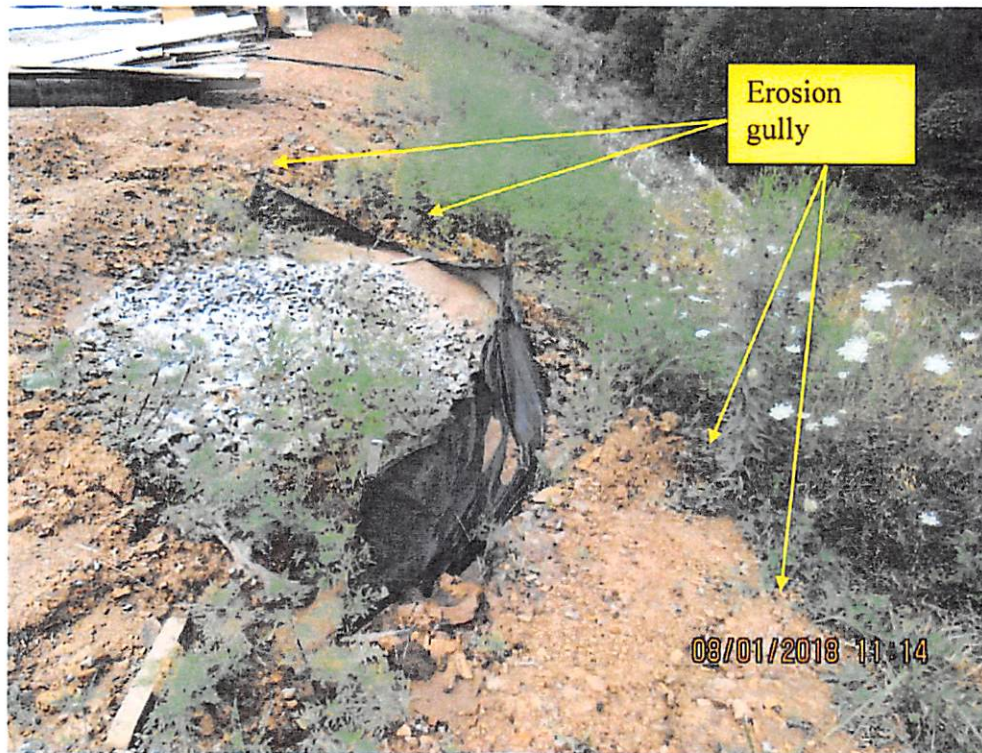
Sediment build-up at silt fence improperly installed in erosion gully. Additional erosion gullies around filled silt fence. Sediment and further erosion down-gradient of silt fence.
